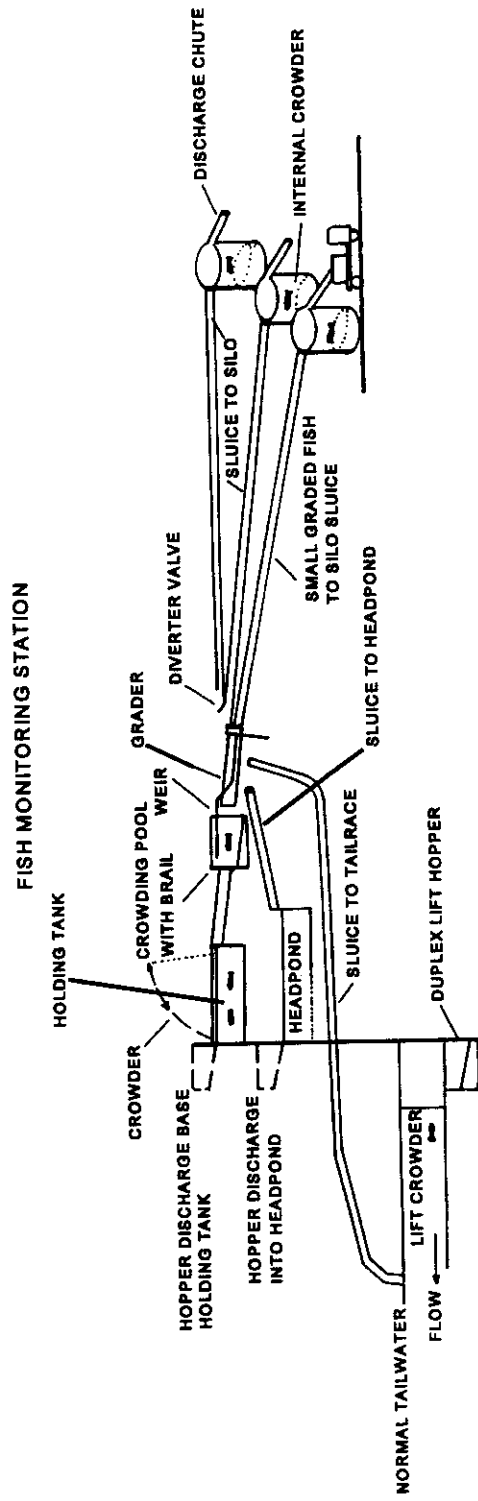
Side view of fish passage facilities at Veazie Plant C (Source: BHE 1990h).
